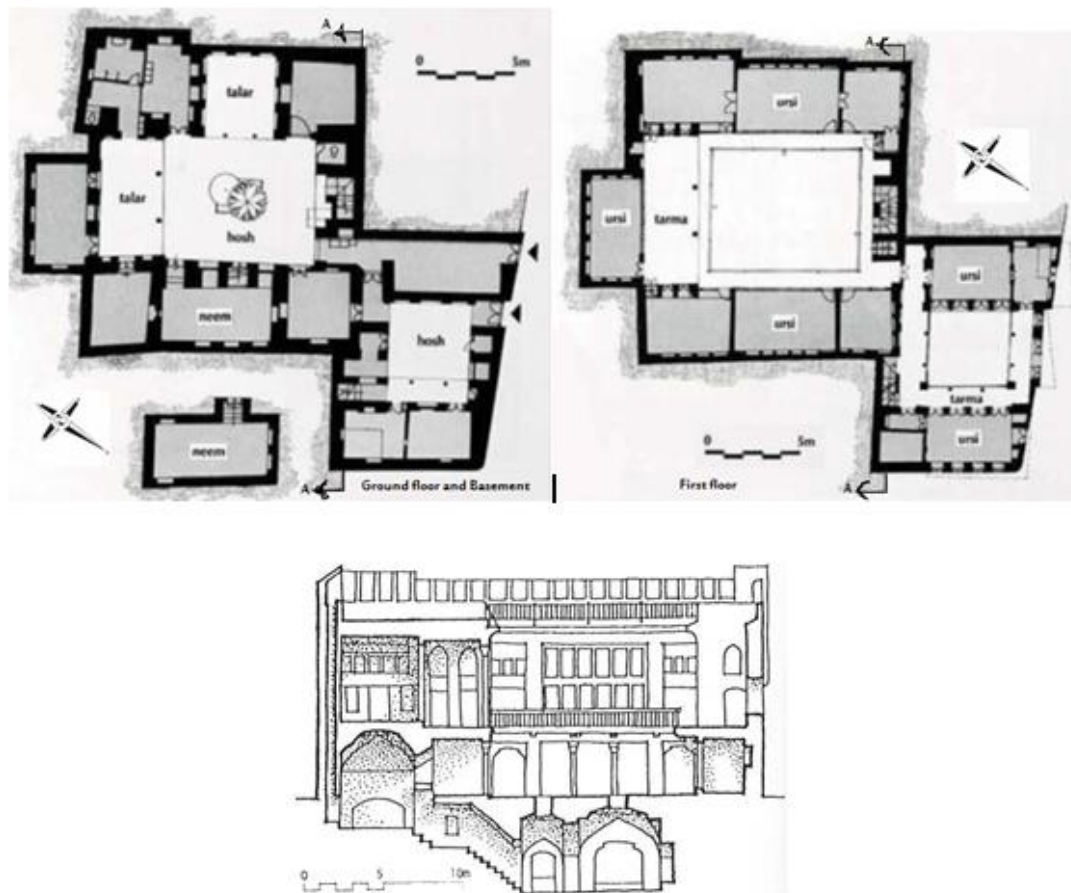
Basement, Ground, First floor and section plans (Warren & Fethi, 1982)
